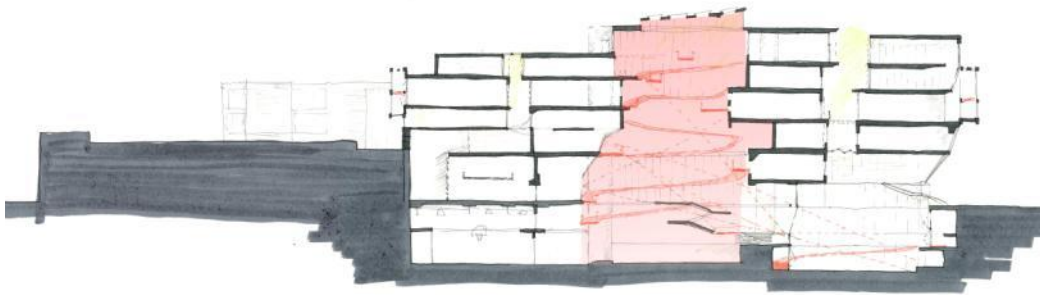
Longitudinal section through ramping at metro. Three sectional shafts connect the interdependent areas of the building.
